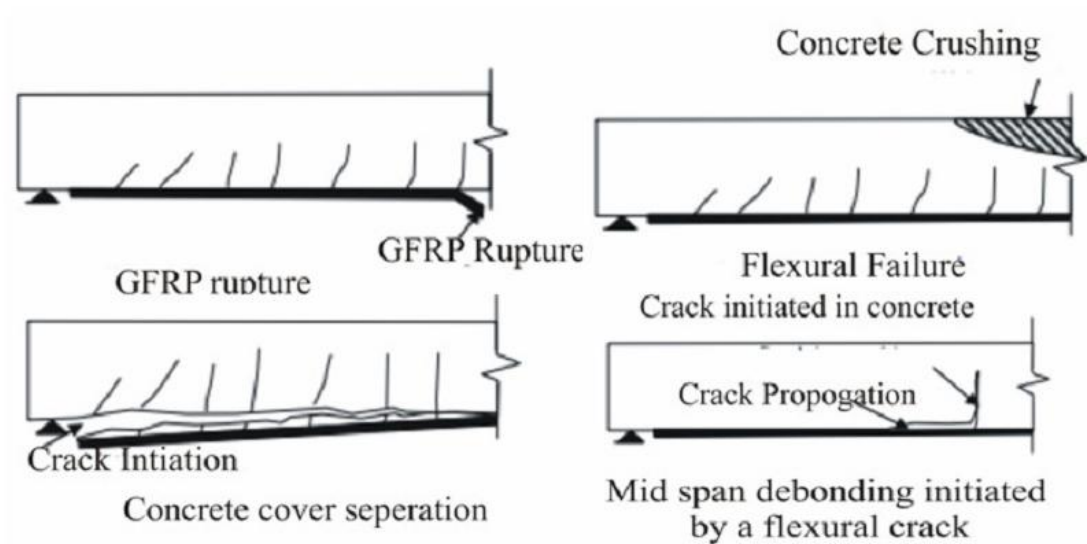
Typical failure patterns of the beams (Parikh and Modhera, 2012)
